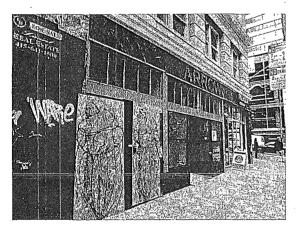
Photograph of entrance bays along Kearny Street. Note wood-clad columns and wood transom (photograph taken on 01/26/2018).
